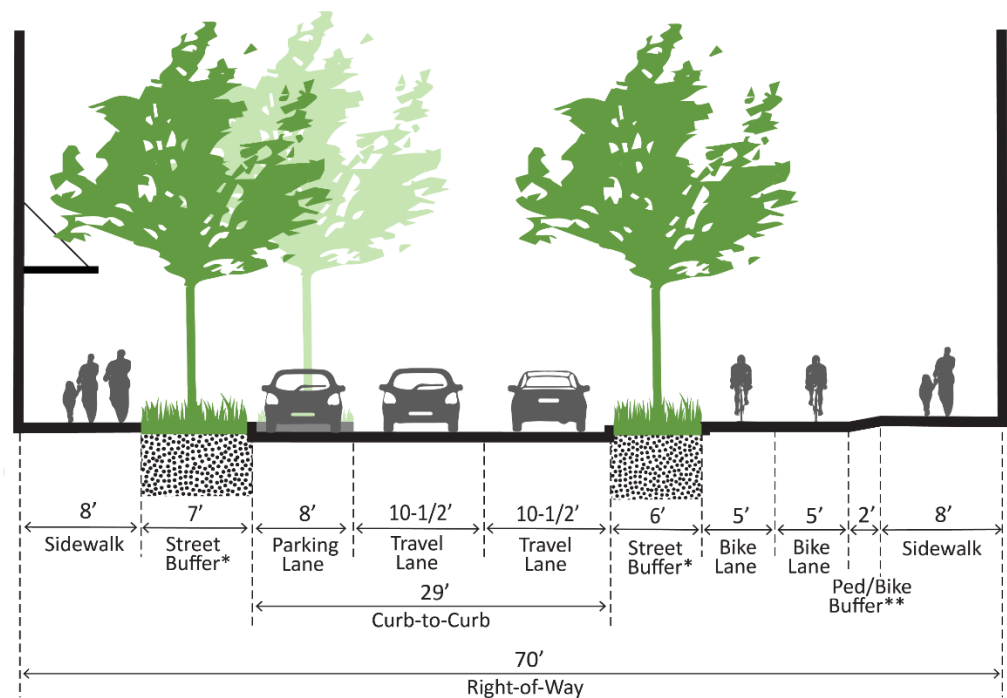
1st Street (B-1): Spring Street to Fenwick Lane, Looking North
